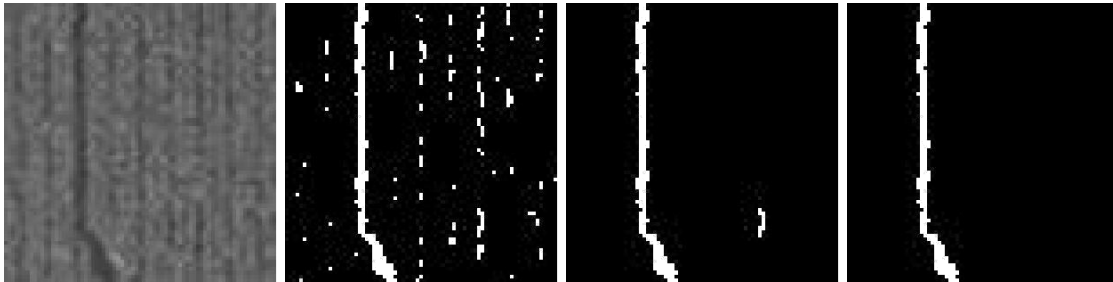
Example of continuous pavement crack (from left to right): raw crack block, local filtering, minor removal, and maximum extraction
